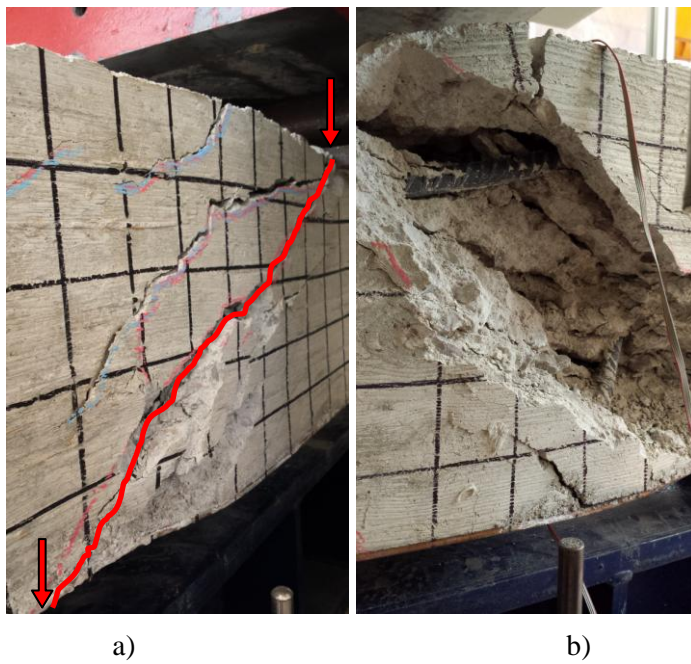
Specimen A2-1: a) main diagonal shear crack; b) view of the upper chord and the tensile web bar of the truss across the diagonal crack.
